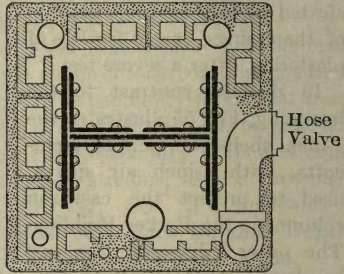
Column Protection, Continental Trust Company Building, Baltimore Fire.
